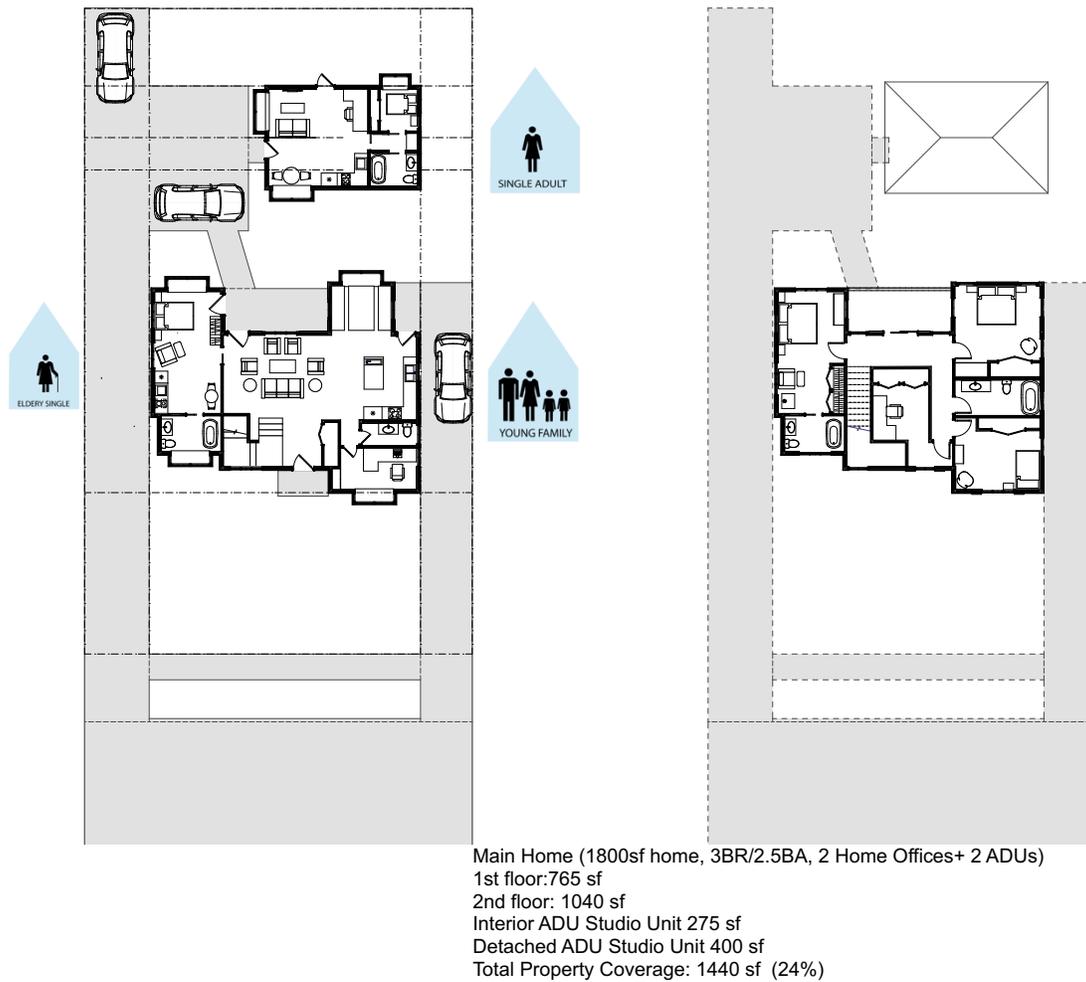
Floor Plans of Home with 2 ADUs. Source: Author
